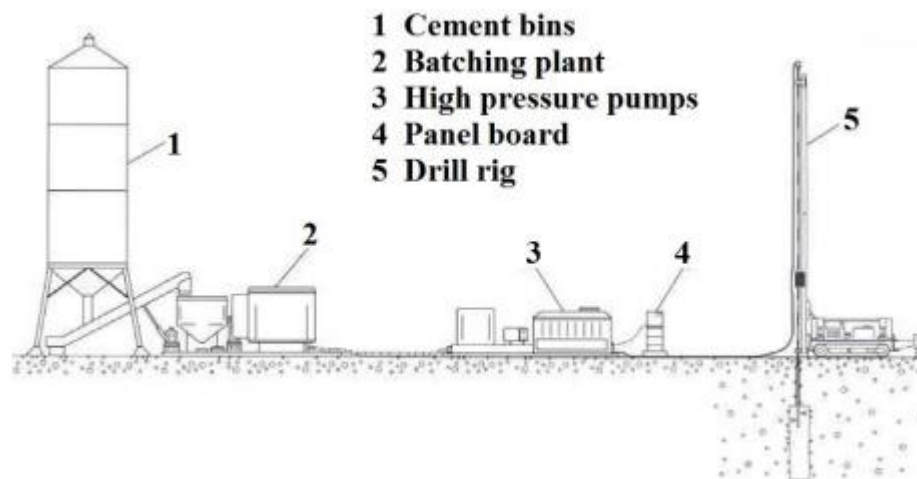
The Equipments of jet grouting application(Source:Croce et al. 2014).
